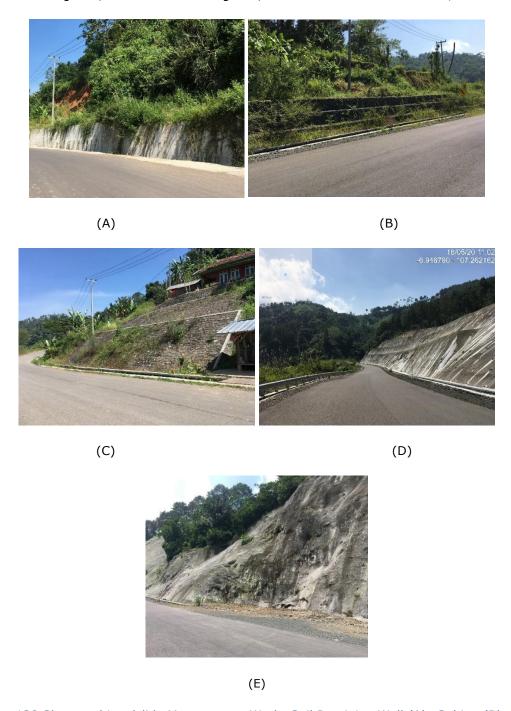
Slope and Landslide Management Work; Soil Retaining Wall (A); Gabion (B); River Stone Retaining Walli (C); Rockbolt (D); dan Shortcrete (E)
